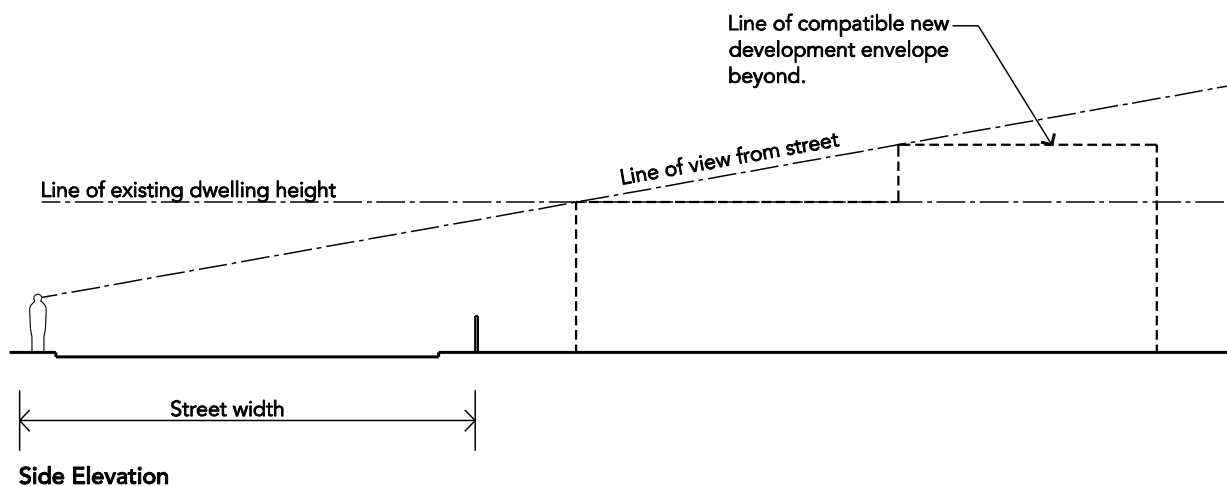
Side elevation illustrating compatible roof envelope – *Griffiths Architects 2012*.
